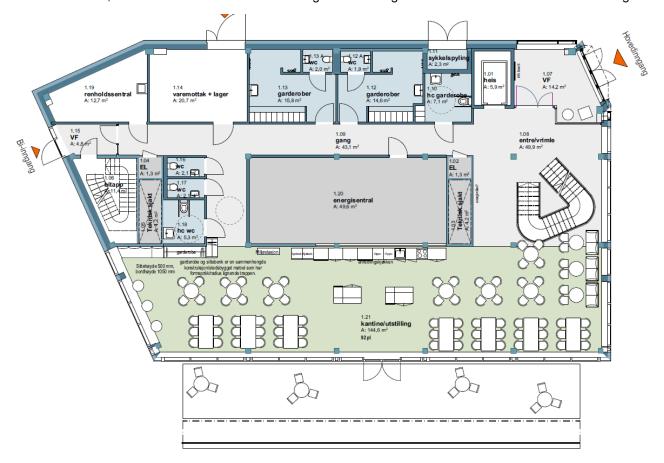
Layout of the first floor of the ZEB Lab. Illustration: LINK Arkitektur
